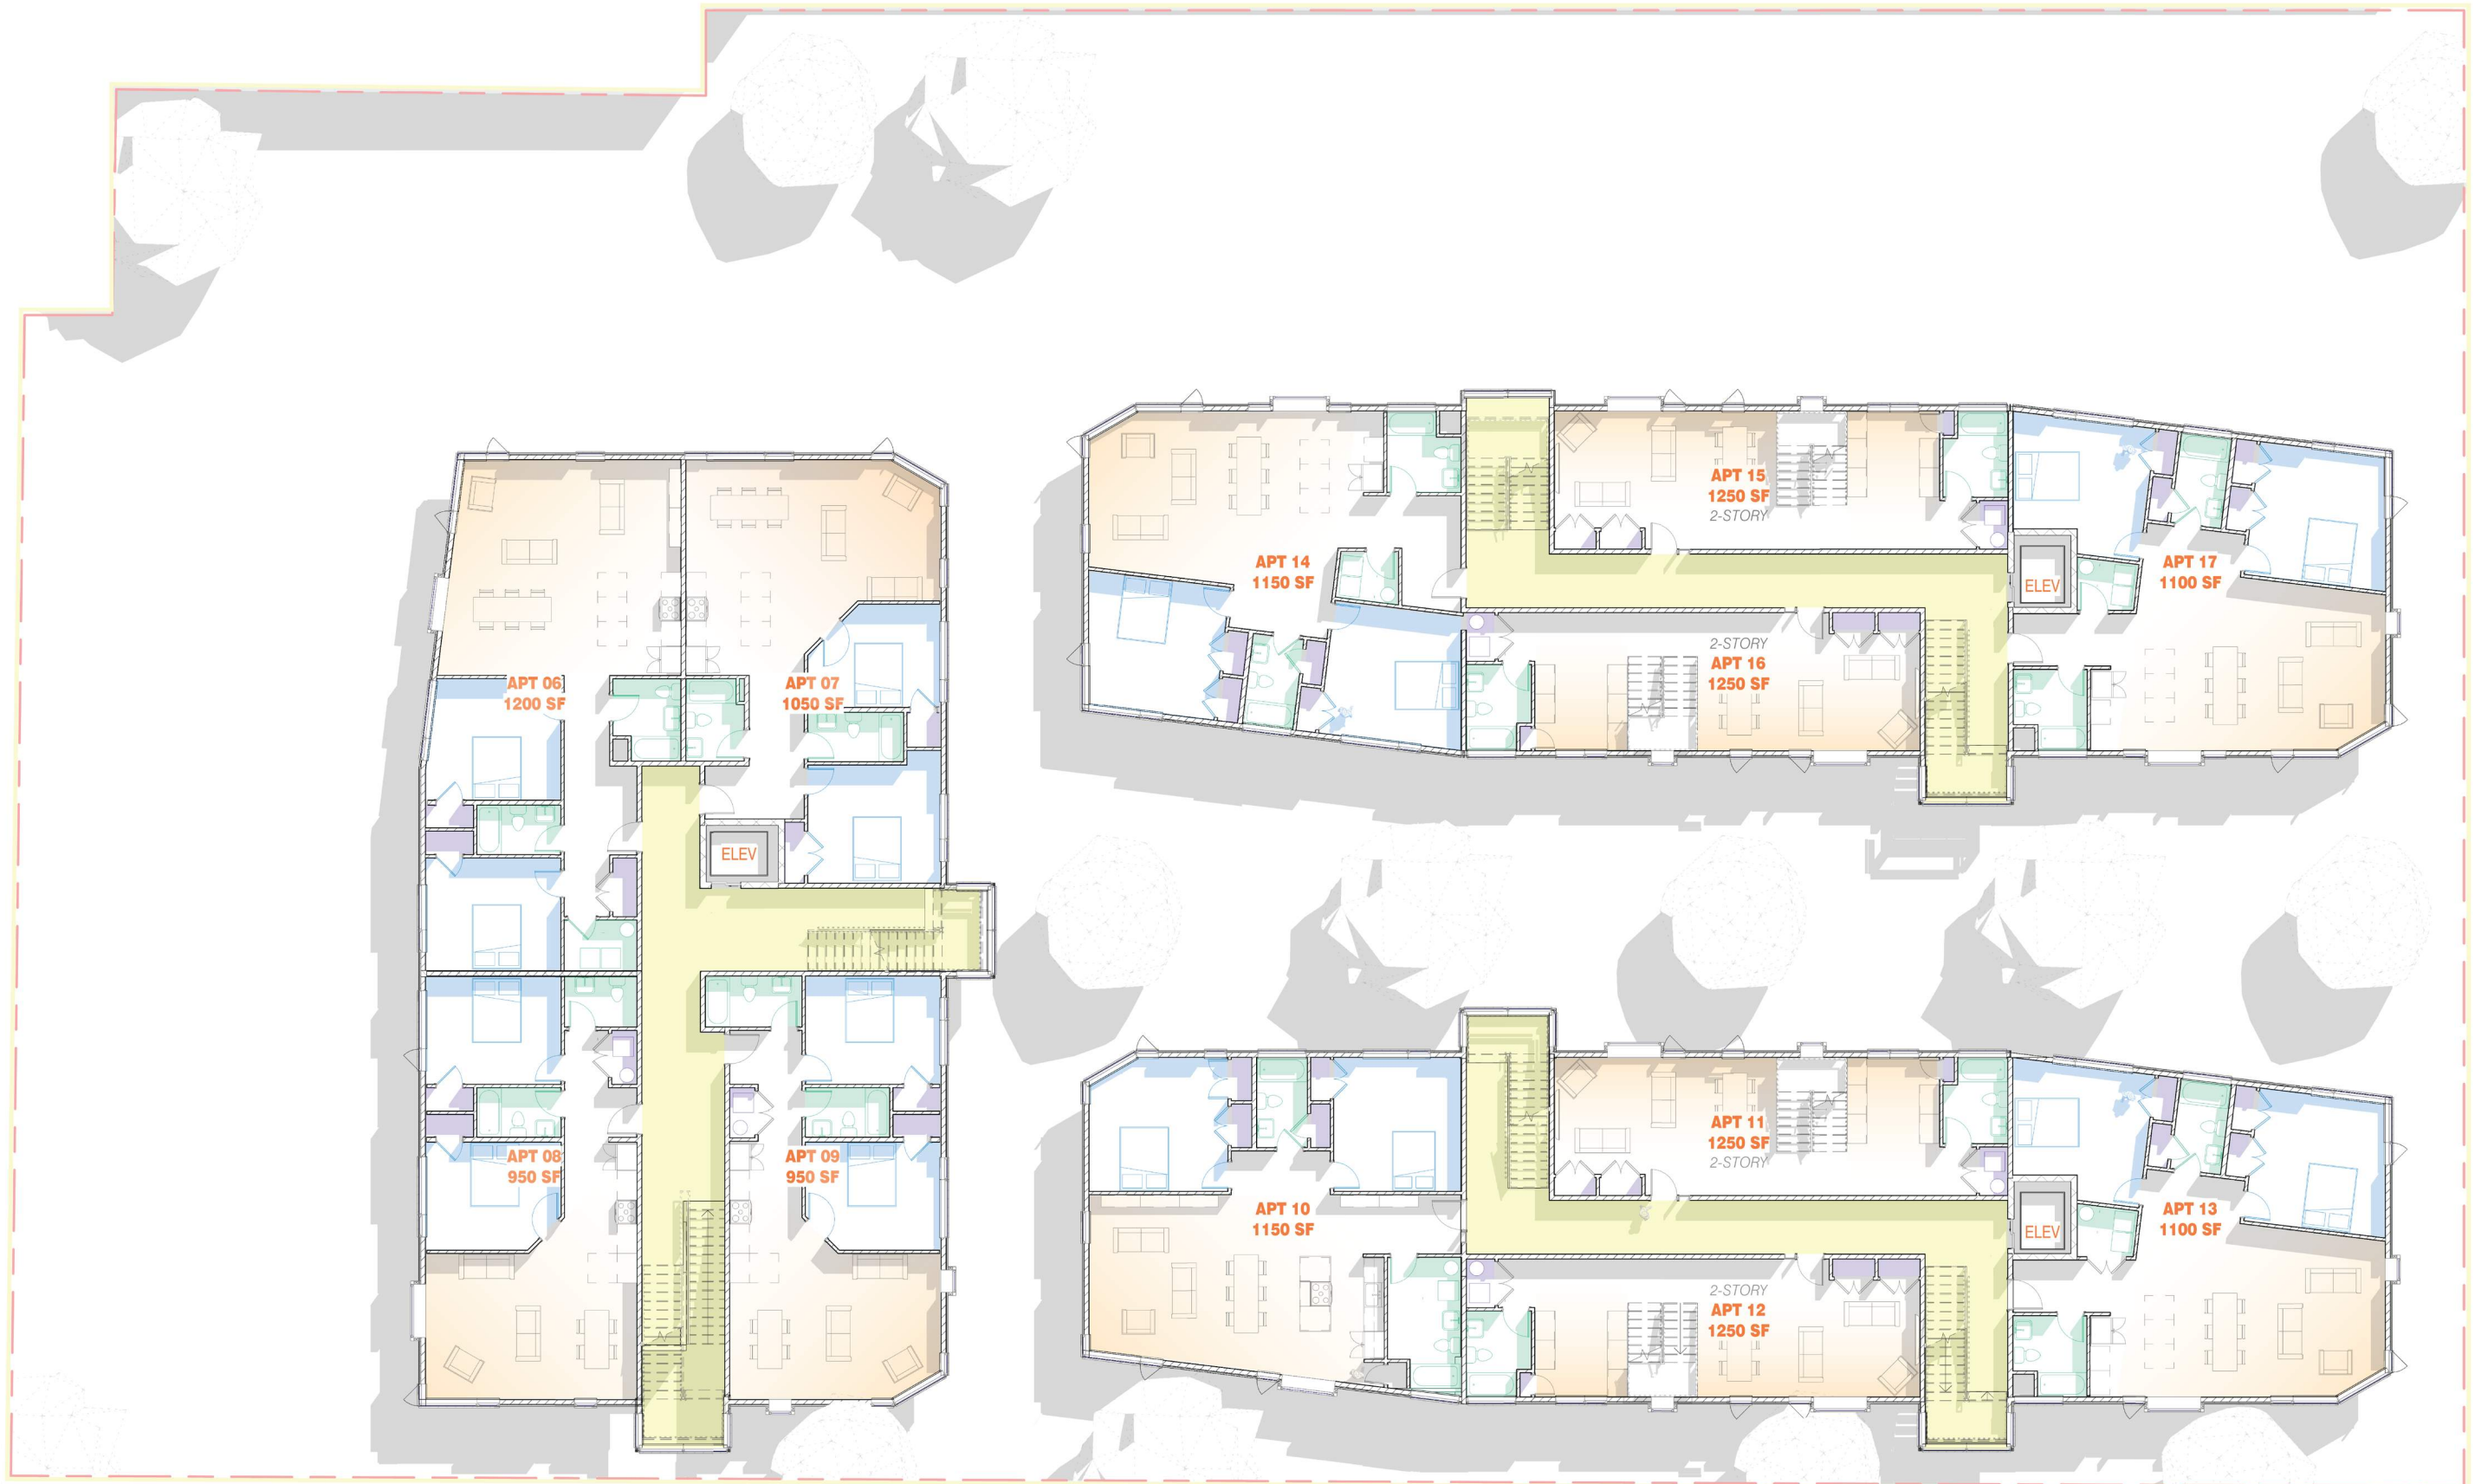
\_ LEVEL 02 FLOOR PLAN
